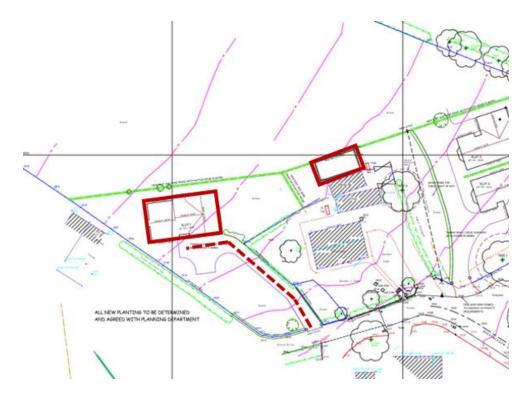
above shows the unbuilt third house and outbuilding and second access to the site from the approved development.
